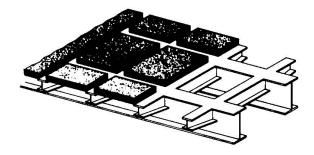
Precast slab elements on a steel structure made of two I-shaped beams
